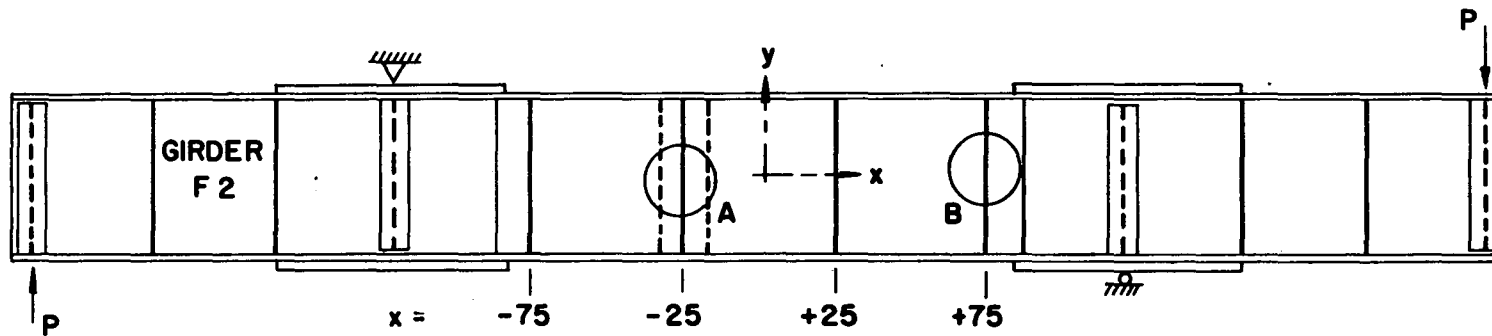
Crack Location and Repairs, Girder F 2
